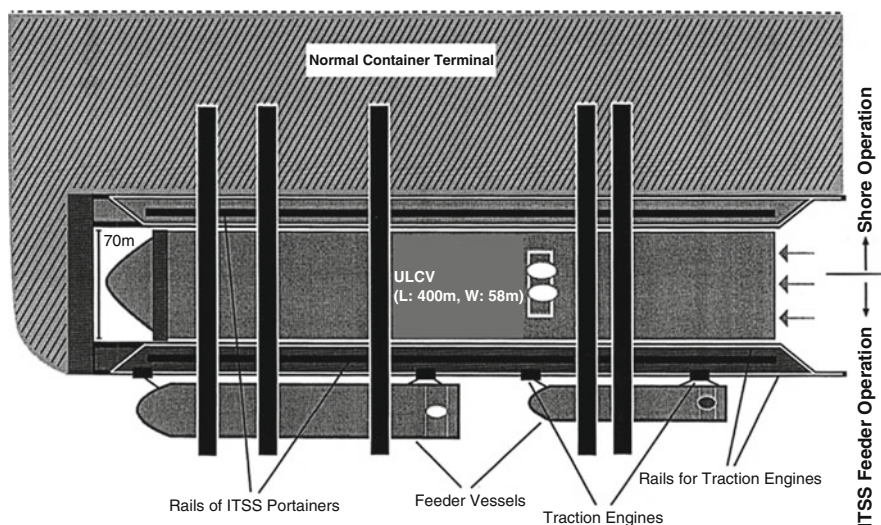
ITS system alternative with one finger pier and 5 portainers handling domestic cargo at the quay wall and transshipment cargo at the finger pier (see March 2004, p. 17)
